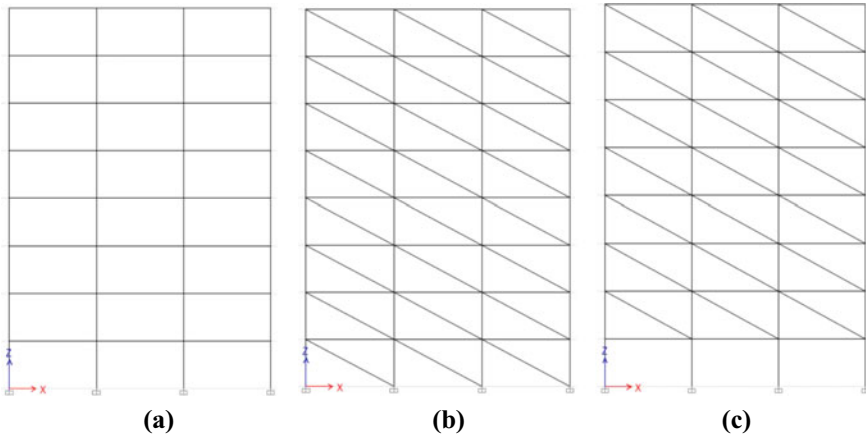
RC frame configurations: a bare frame (BF), b fully masonry infilled frame (IF), c open ground storey frame (OGSF)
